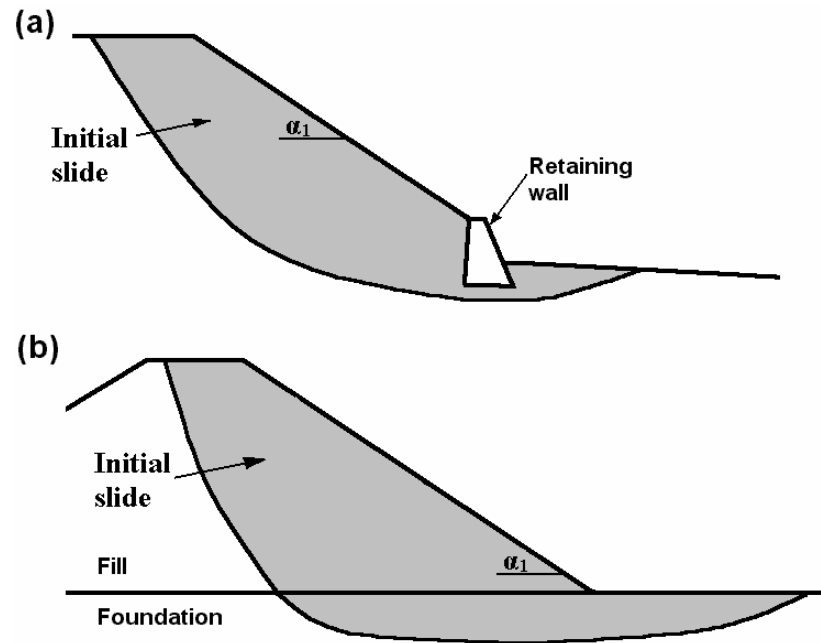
Type 5 slope failure geometry. The surface of rupture extends below and daylights beyond the toe of the slope; (a) retained cut or fill slope or (b) deep seated failure through the foundation of a fill embankment.
